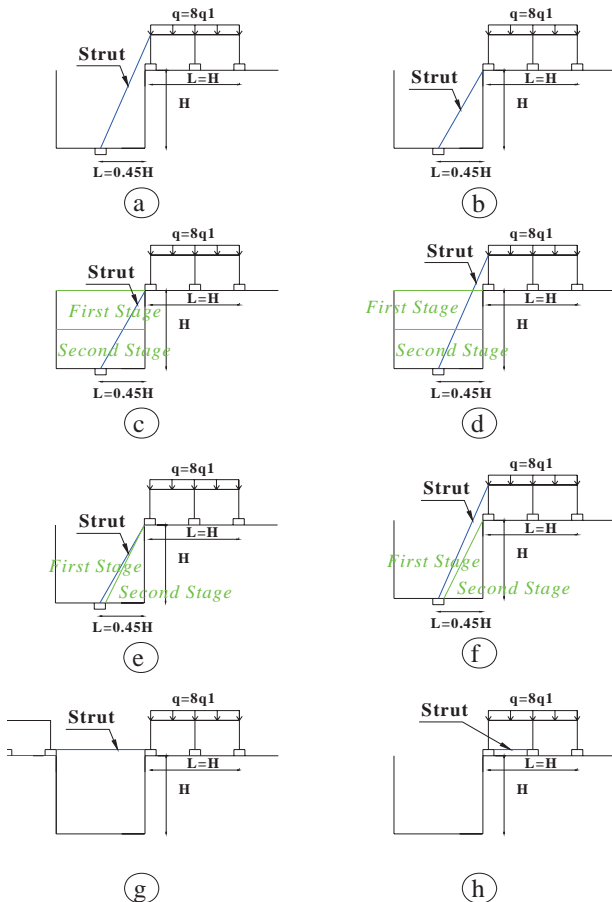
several most common configurations of excavation procedure used in traditional shoring method. (a) Inclined struts connected to the first floor after full excavation. (b) Inclined struts connected to the footing after full excavation. (c) Inclined struts connected to the footing after full excavation done in two stages. (d) Inclined struts connected to the first floor after full excavation, done in two stages. (e) Inclined struts connected to footing after the first stage of excavation, done in two stages. (f) Two adjacent footing of neighbouring building are fully connected. (g) flying shoring.
